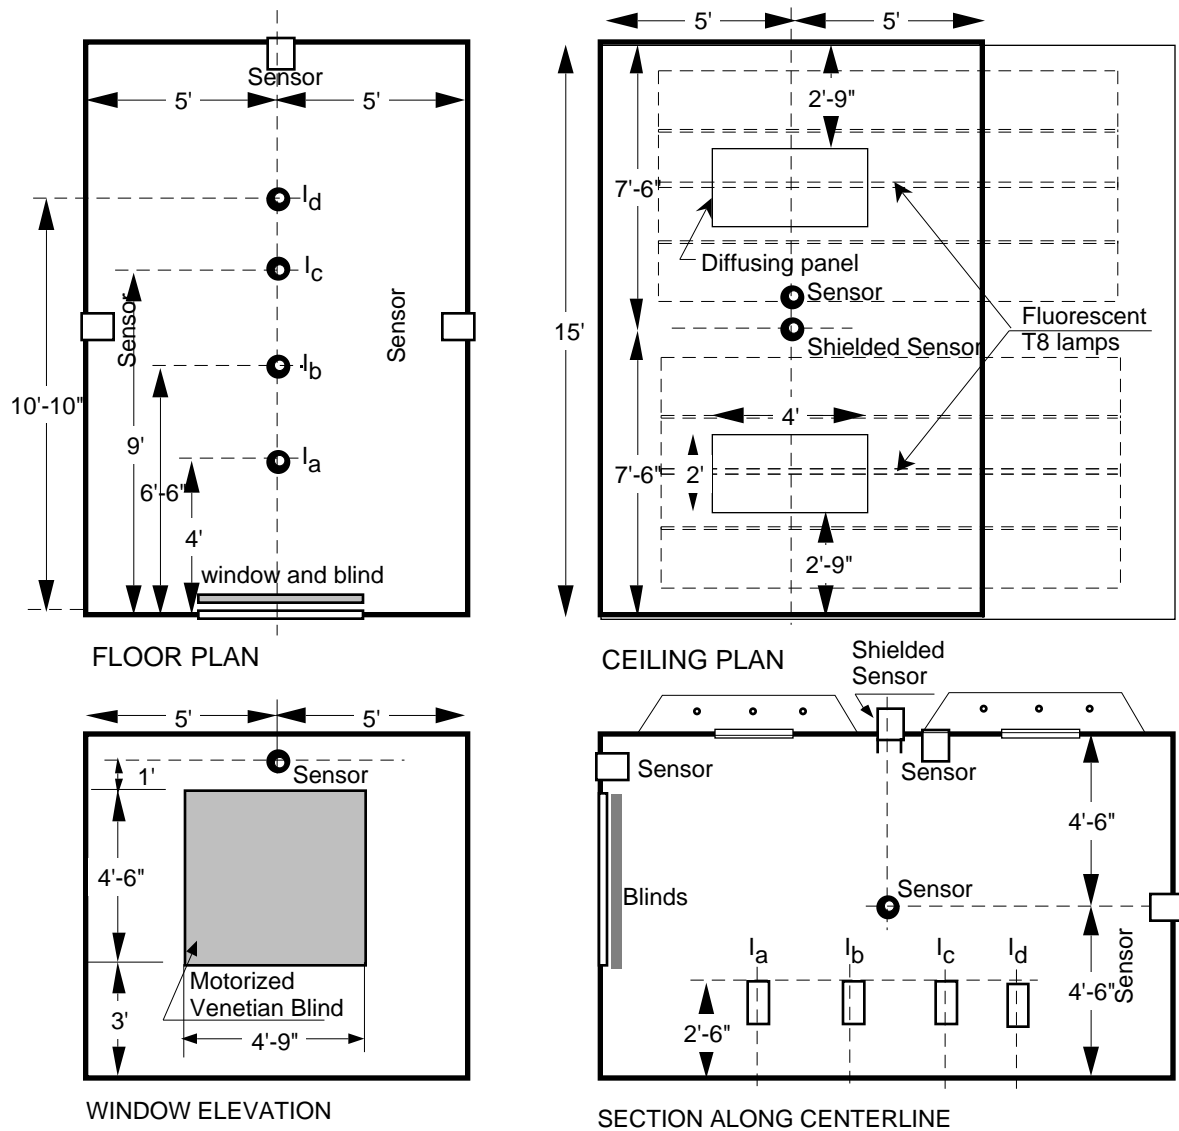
Plan and section of 1:3 reduced-scale model. Dimensions are shown in full-scale.
